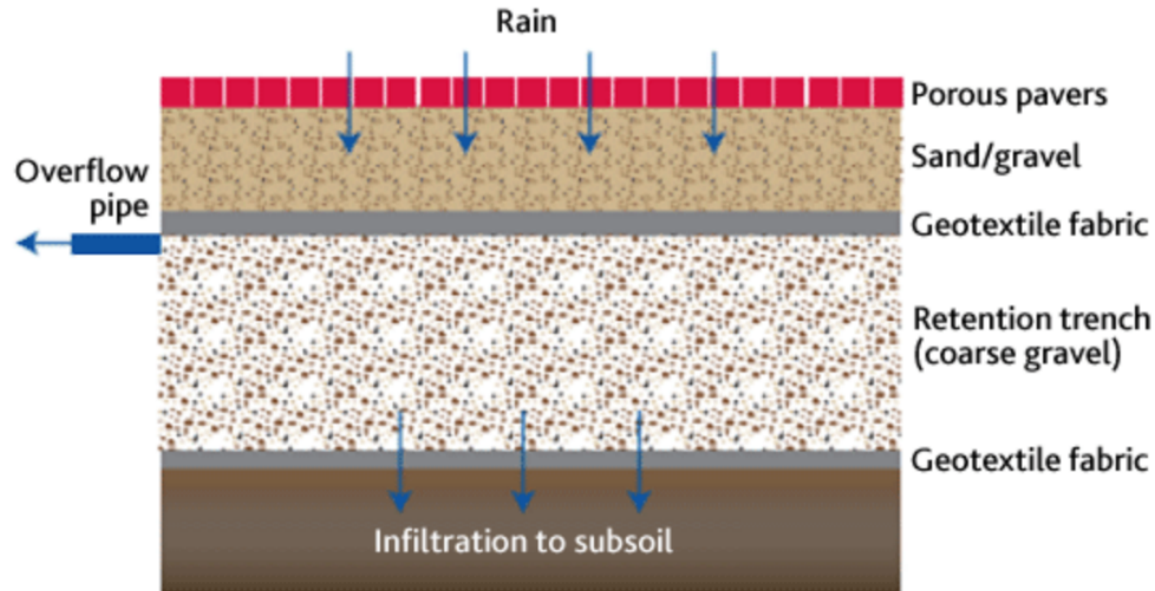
Driveway treatment drawing. Source: Melbourne Water
